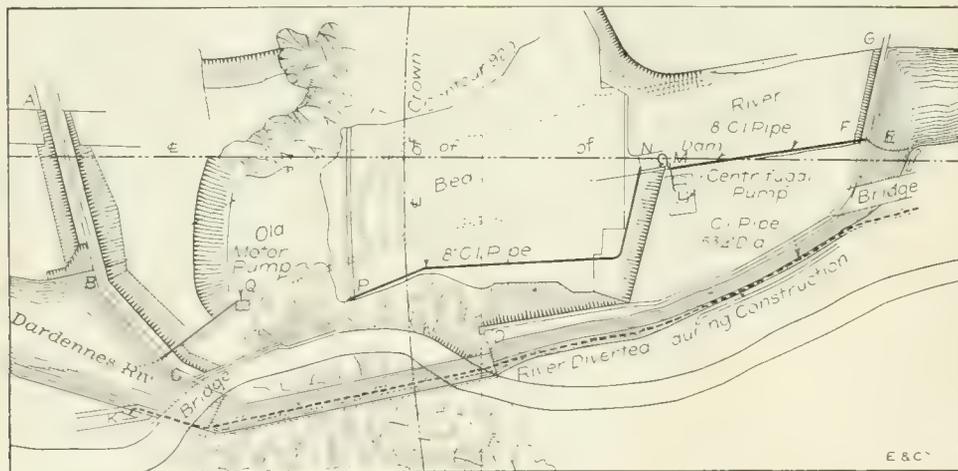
Plan Showing Works for the Diversion of the River During the Construction of the Dam.
